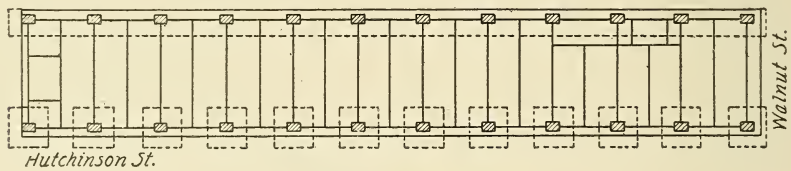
Structural Floor-Plan of Mershon Building, Philadelphia, Pa.
